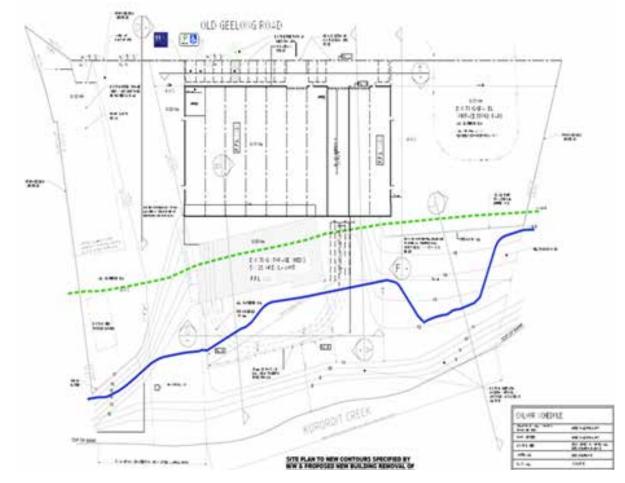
SITE PLAN FOR 716 & 720 OLD GEELONG ROAD
